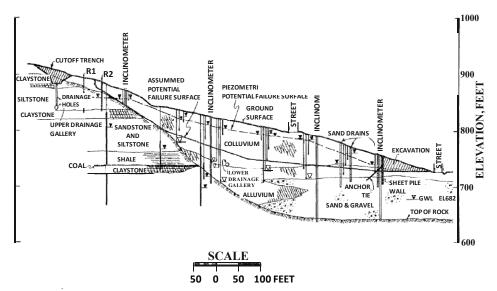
Cross section of slope showing instrumentation, excavation and potential failure surface (from D'Appolonia et al. 1967)
